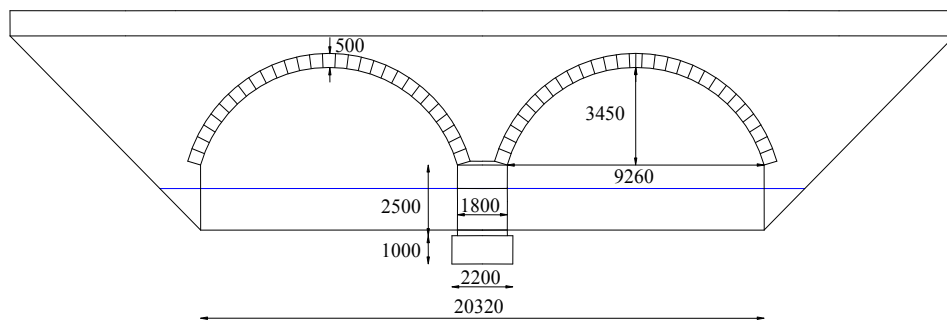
Schematic illustration of the bridge (dimensions in mm).
